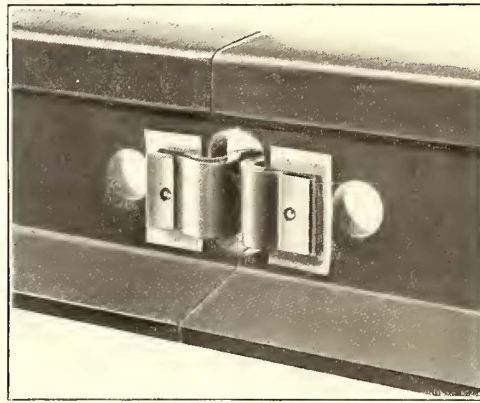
CONSTRUCTION AND APPLICATION OF BOND
